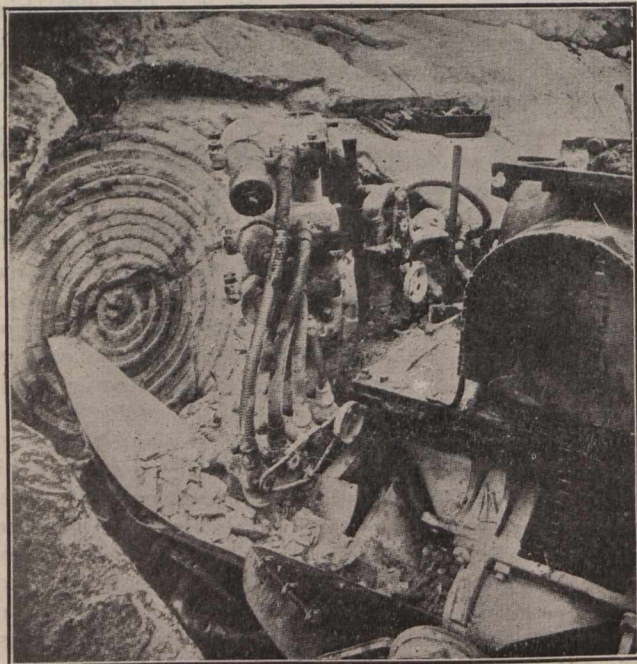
Showing Face of Bore Made by Tunneling Machine.
